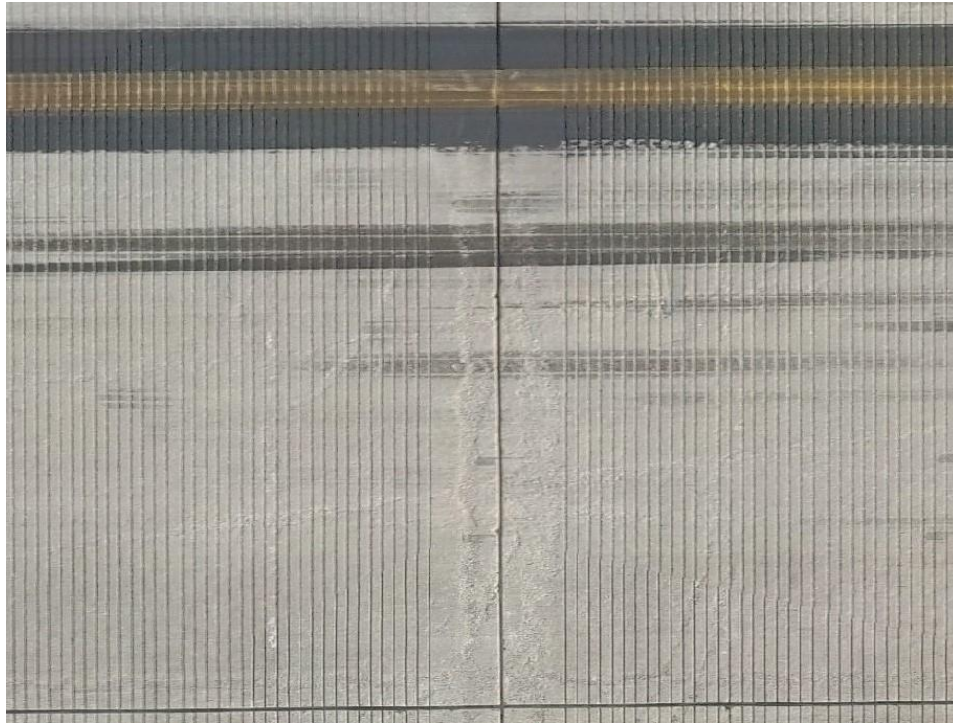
Typical Small Patch at Spall Repair (medium-severity)
